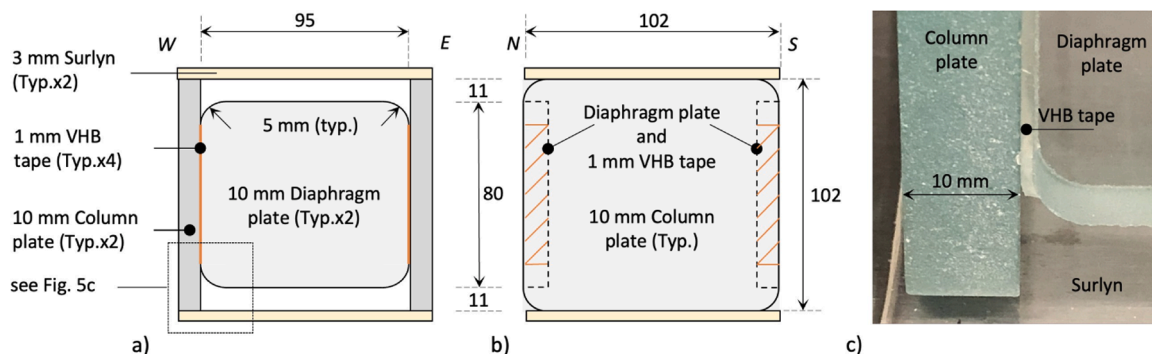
Typical sample details. a) EW Elevation, NS Elevation, c) Connection View.
